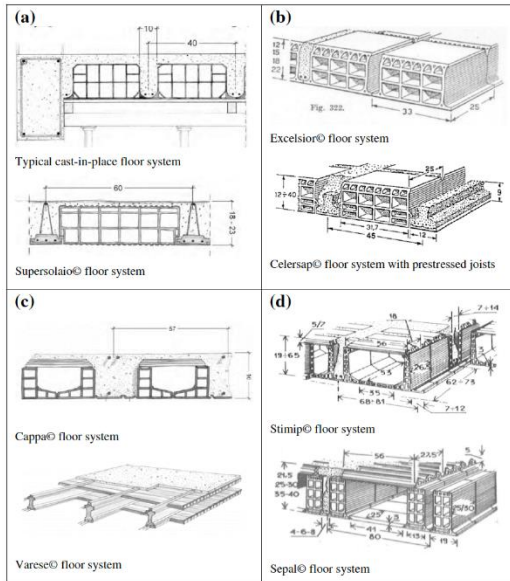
Beam and hollow-clay-block floor systems with (a) and without (b) concrete topping; beam and hollow-clay-block floor systems with blocks composed of different hollow-clay elements with (c) and without (d) concrete topping. From [66].
